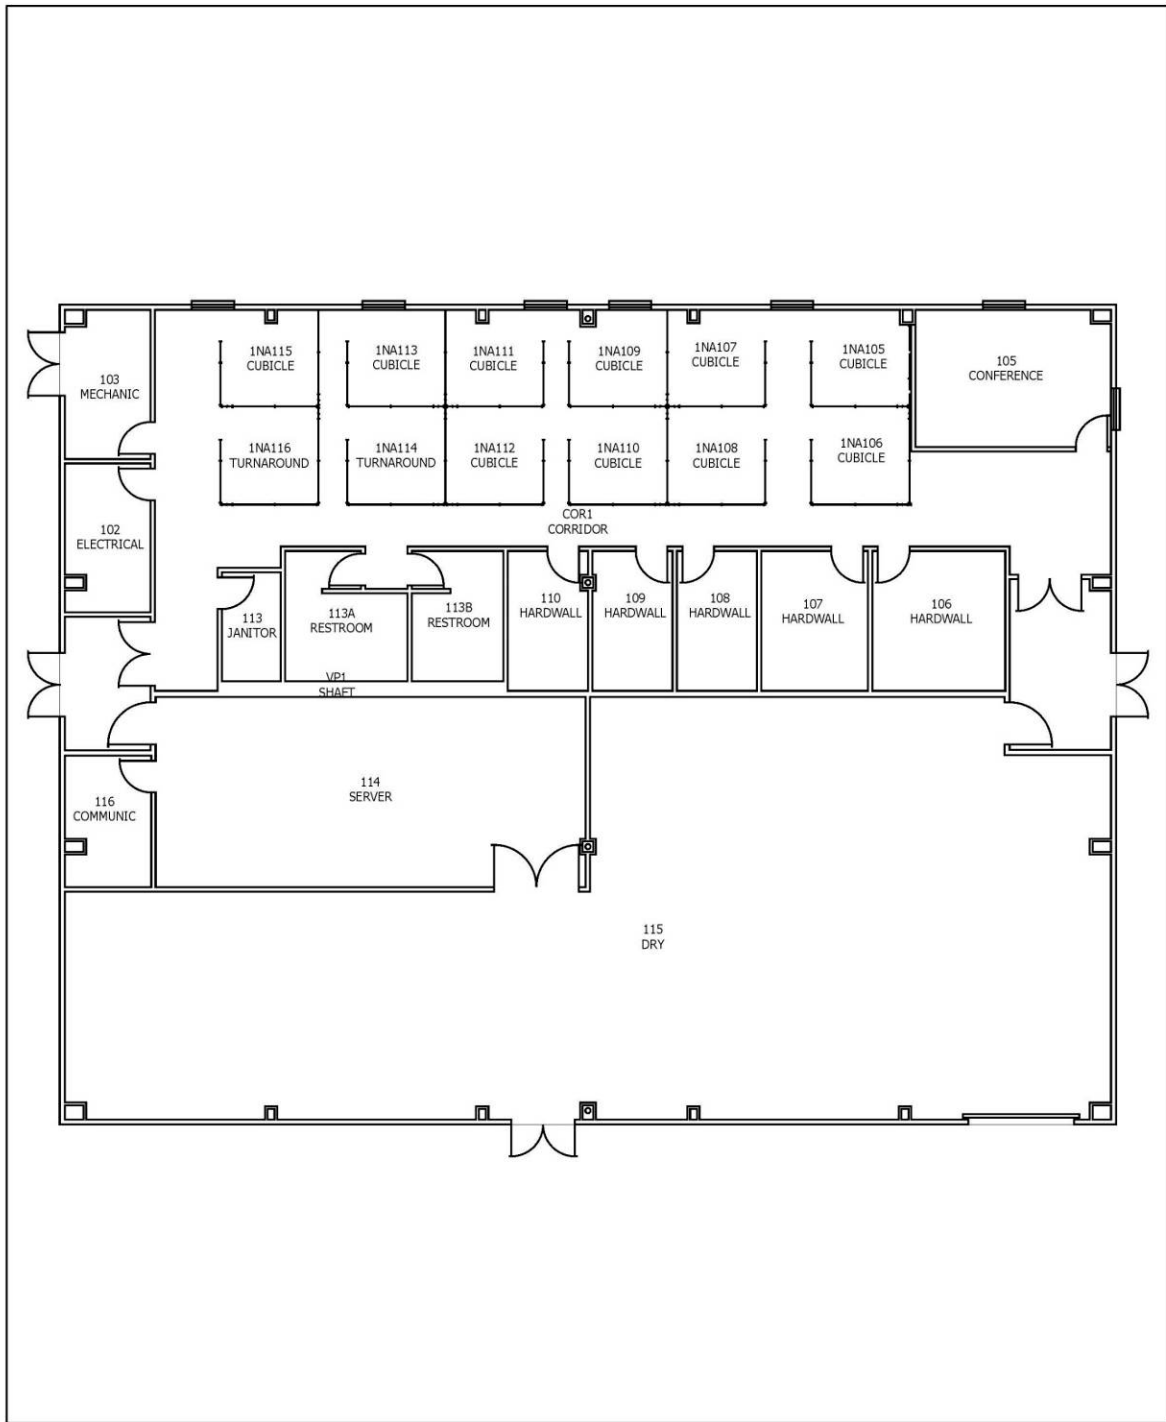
IRC Physics Lab (IF-638) floor plan.
